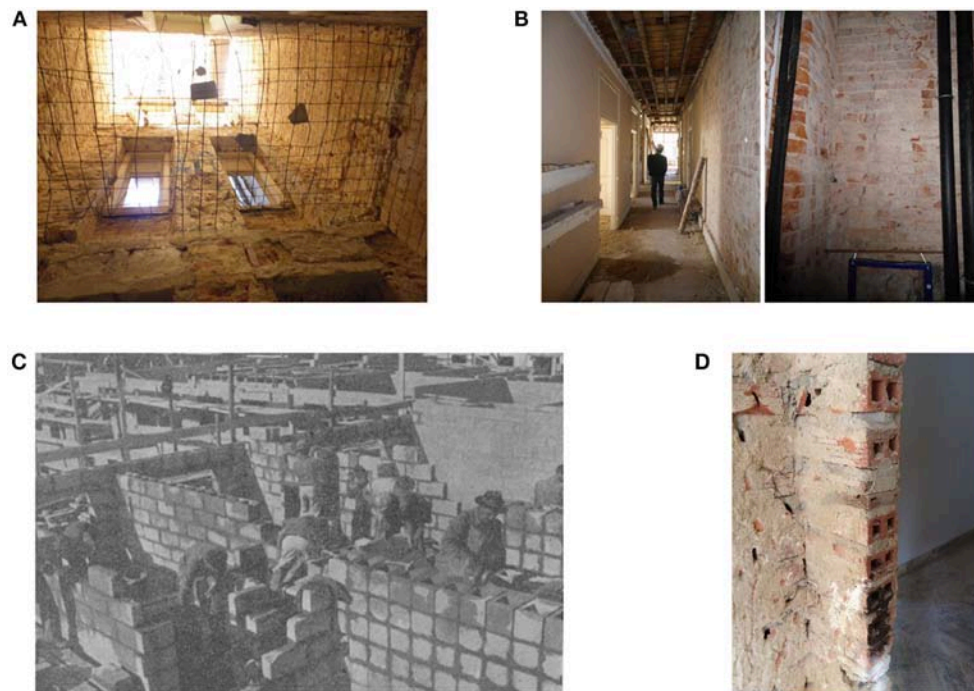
| Masonry walls with different type of materials. (A) Rubble stone, (B) Brick, (C) Concrete block, (D) Connection between walls.
